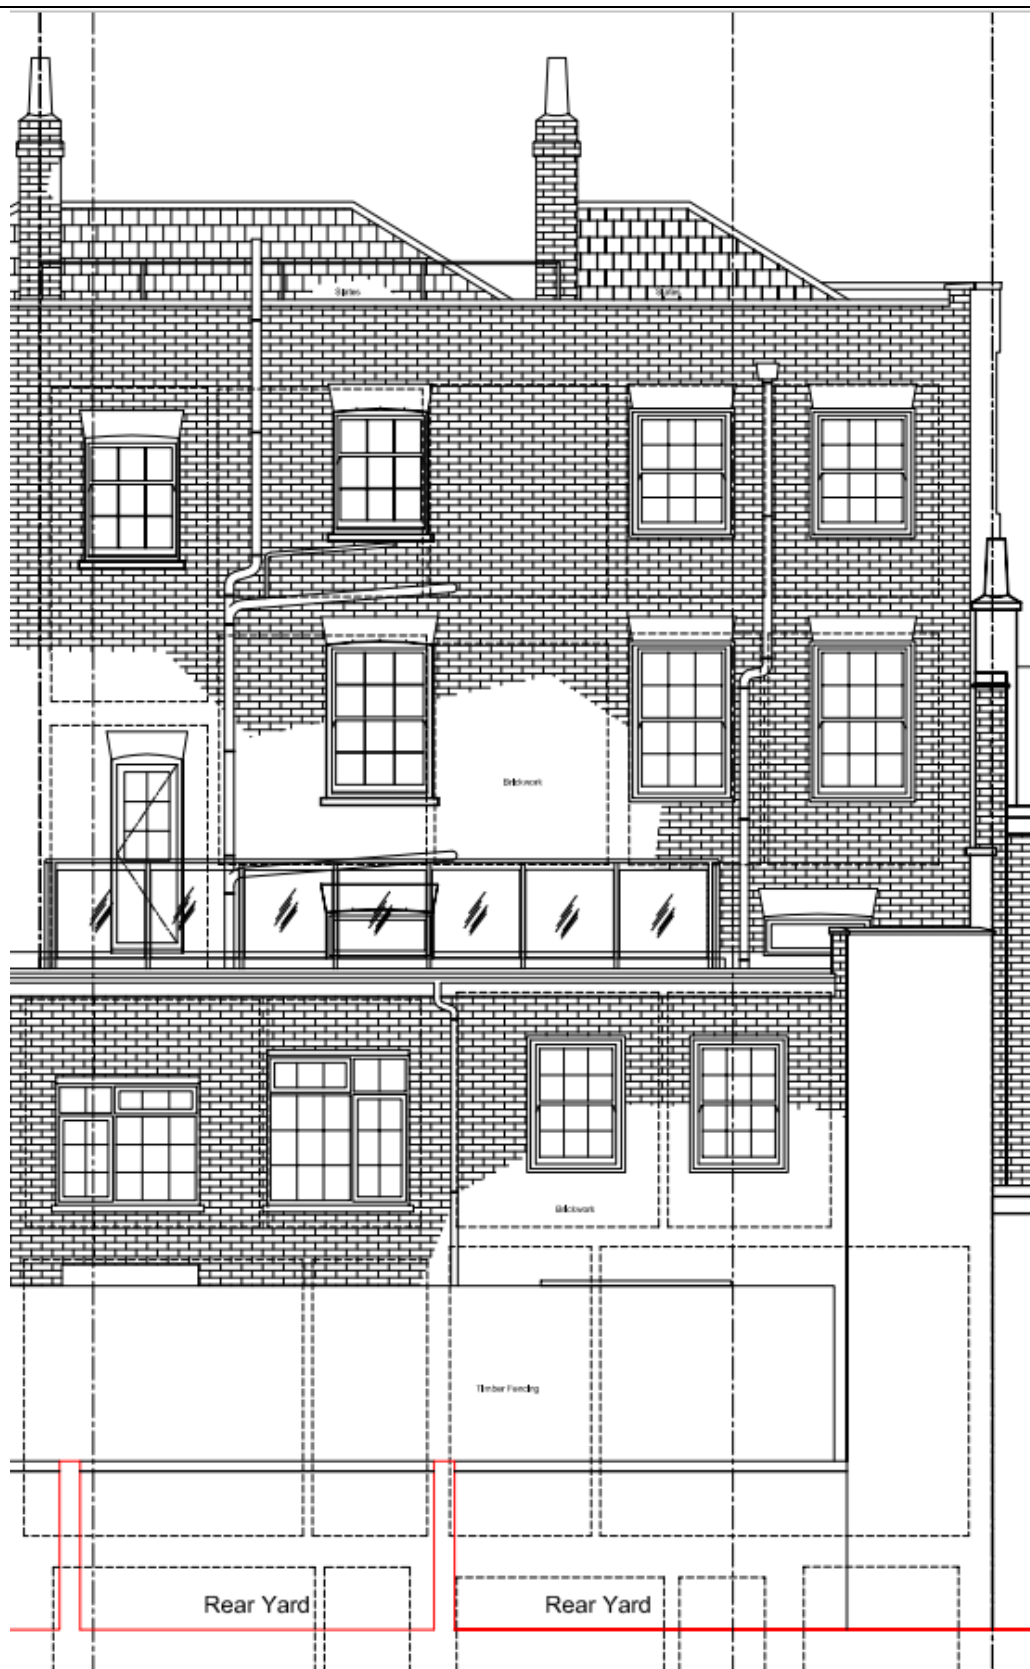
As built rear elevation. It was not possible to view this on site due to the constrained nature of the rear of the building.
